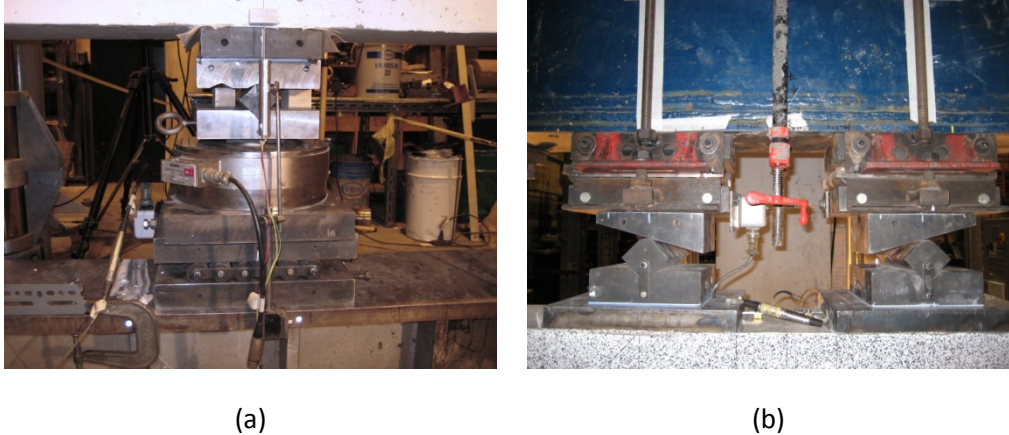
(a) typical reaction consisting of the bearing plate, knife edge, load cell, and rollers (specimen shown has $h = 600$ mm) and (b) typical loading points with rollers, knife edges, and bearing plates (specimen shown has $h = 1000$ mm).
